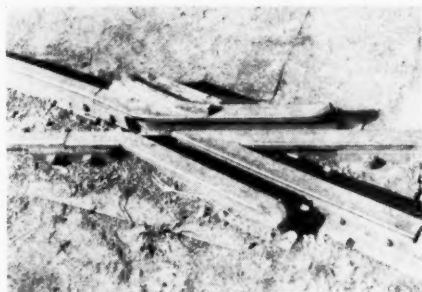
Guide welded to top of frog at Buckhorn to prevent wheels taking the wrong lead.
